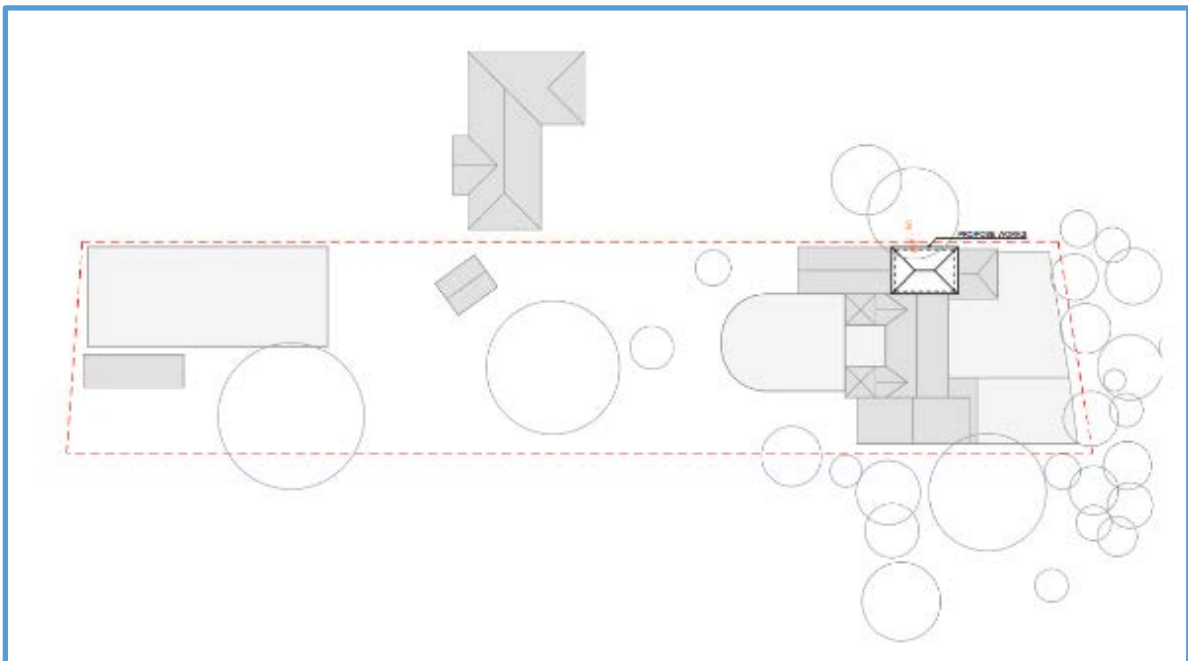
Site Plan indicating location of proposed extension to existing dwelling.
